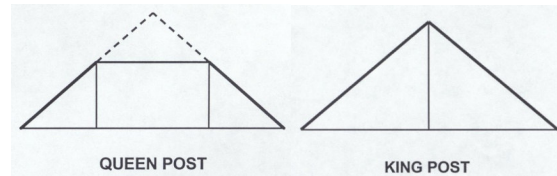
Profile view of the simple forms of the King Post and Queen Post truss adapted from house roof construction for use as bridges.
